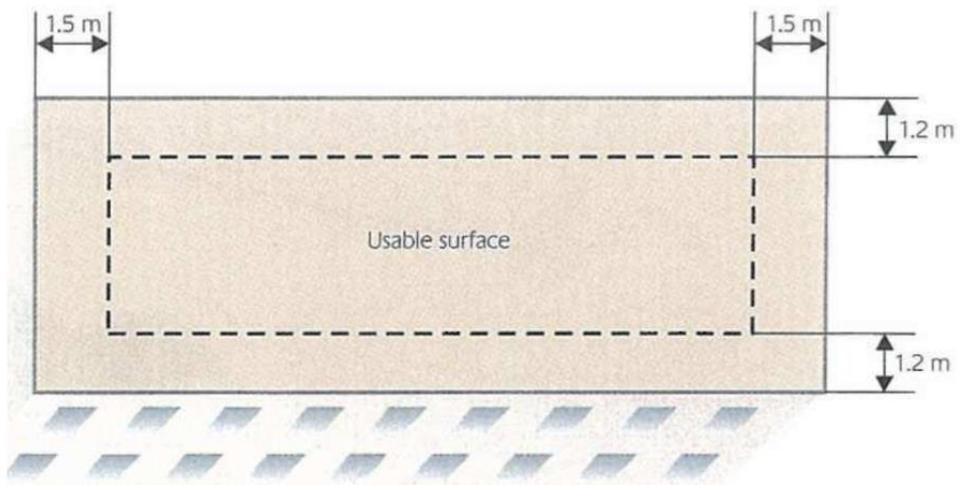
Usable roof space on a flat roof for PV modules [Planning & Installing Photovoltaic Systems, 2nd ed., Earthscan Ltd, London, 2008]
